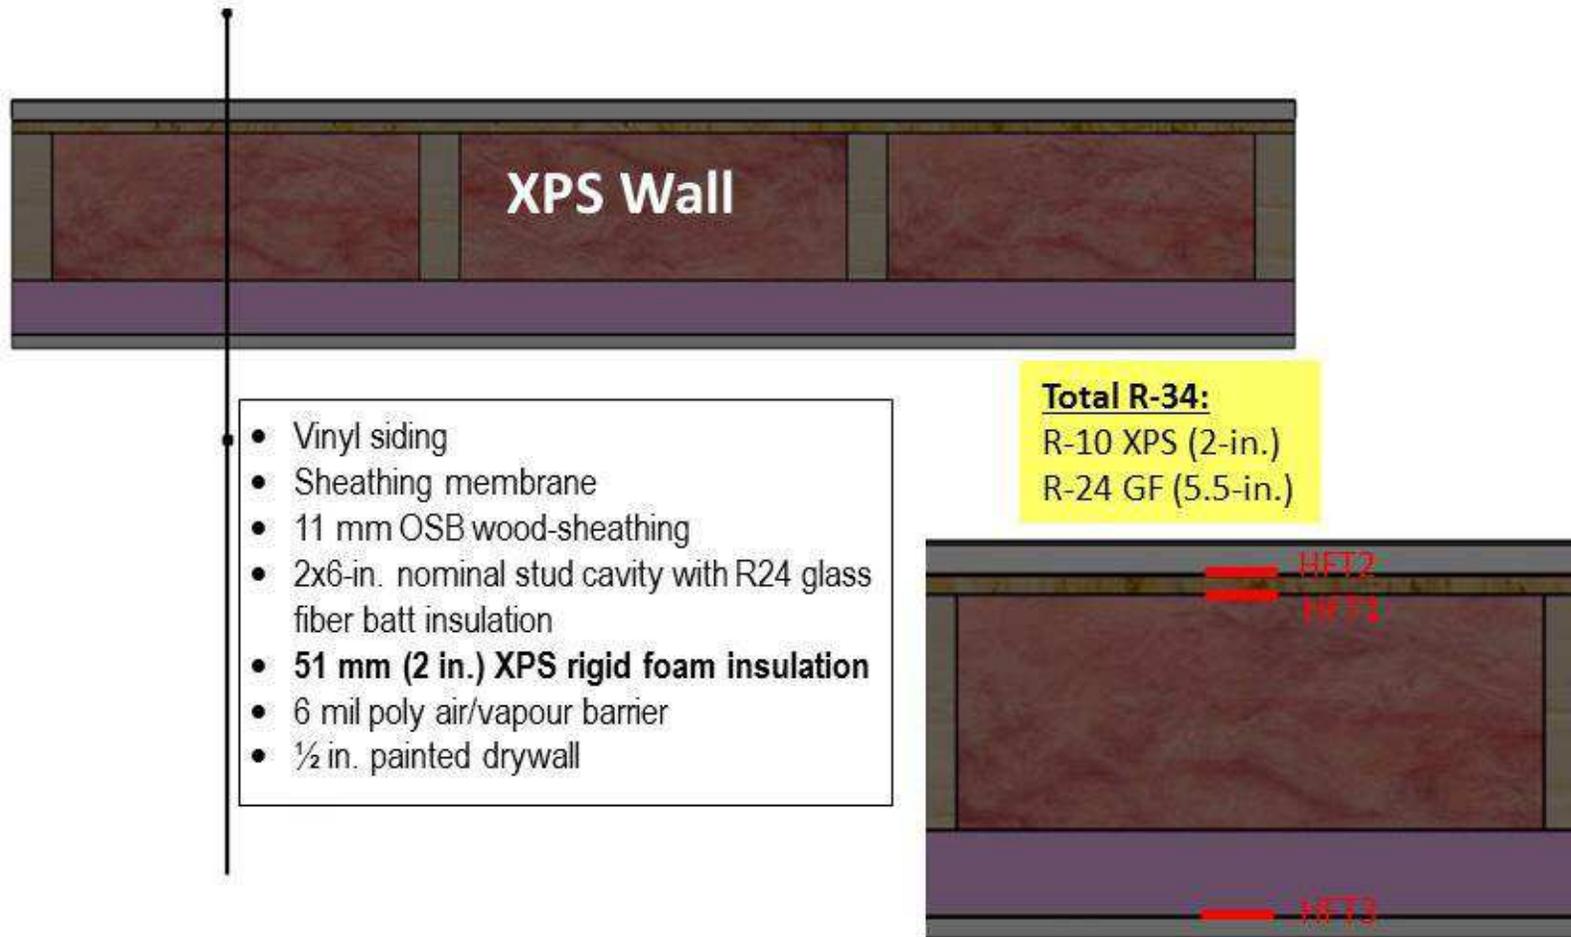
Horizontal cross-section through XPS Wall assembly showing locations of Heat Flux Transducers, HFTs (Wal-4)
